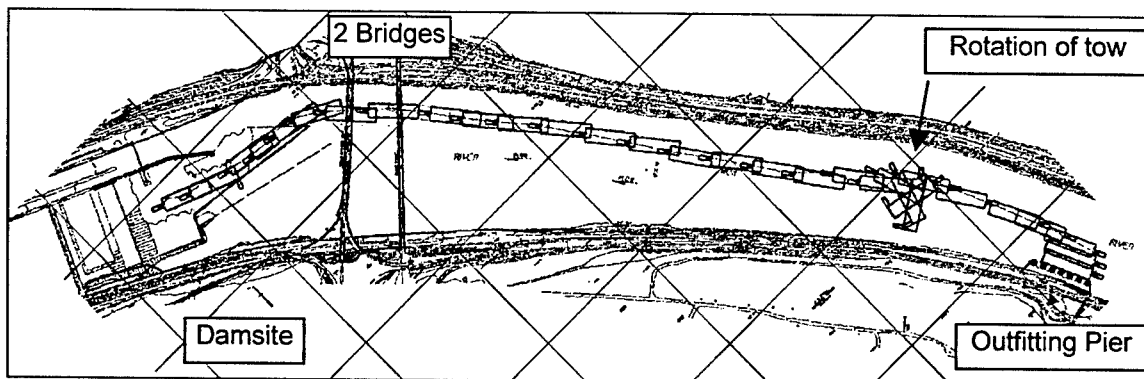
Illustration of final tow of the segment from outfitting pier (right) to damsite (left)
